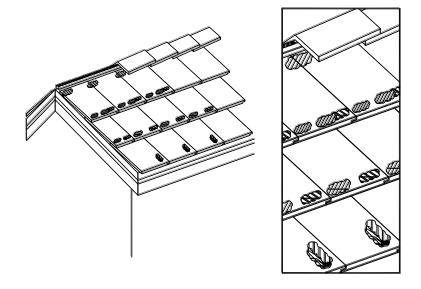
Placement Detail "A" Flat/Low Profile Roofing Tile
